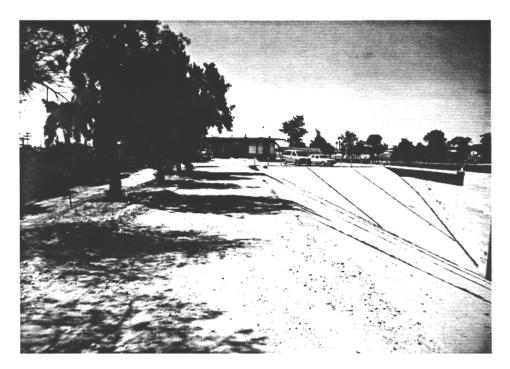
Lytle Creek Intake Structure Looking SW At Control House At West Branch Intake. East Wing Levee In Background.
